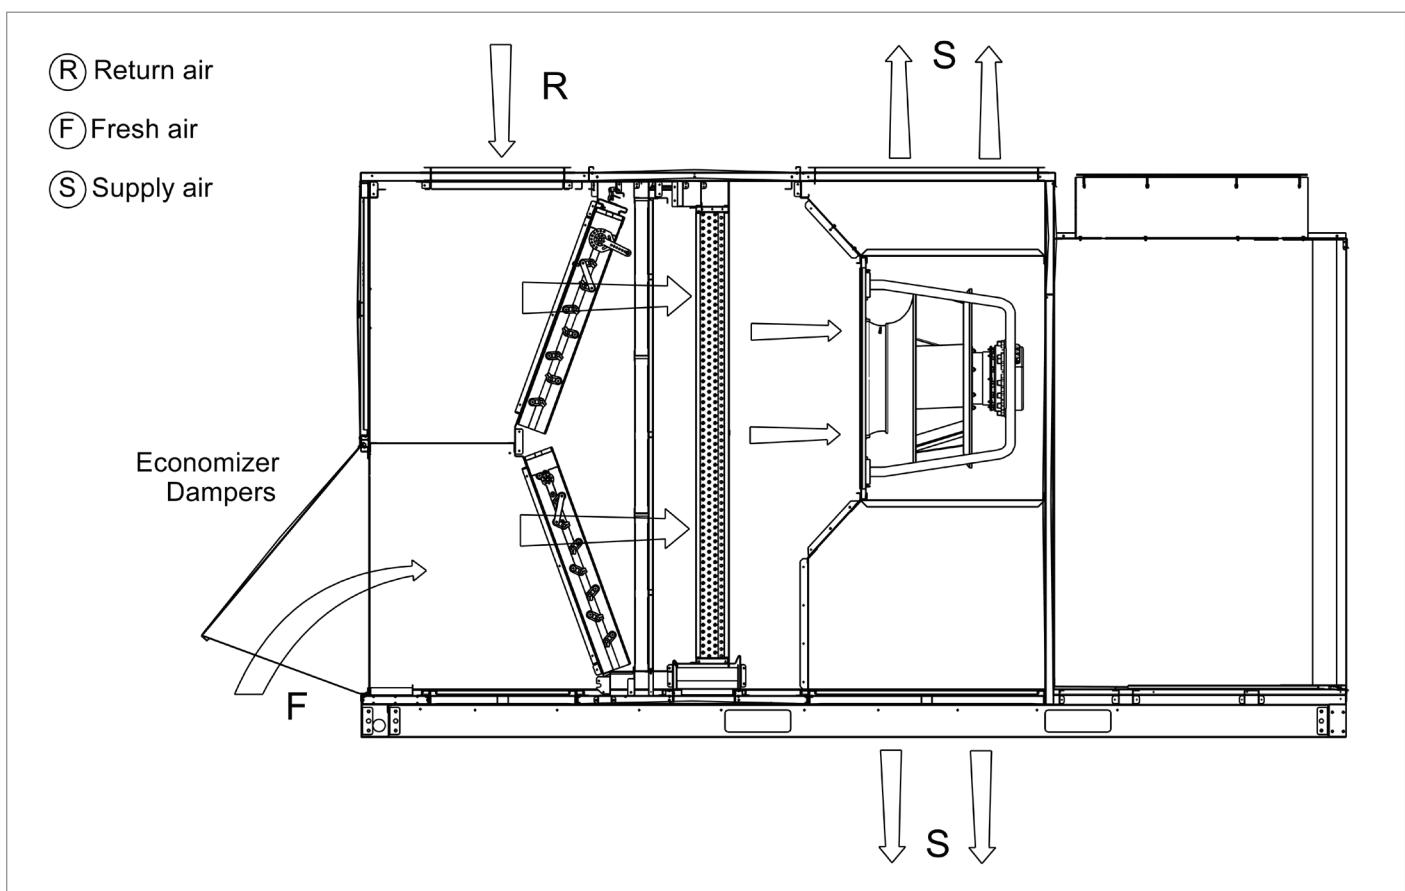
Economizer option - Fresh air inlet from bottom side
